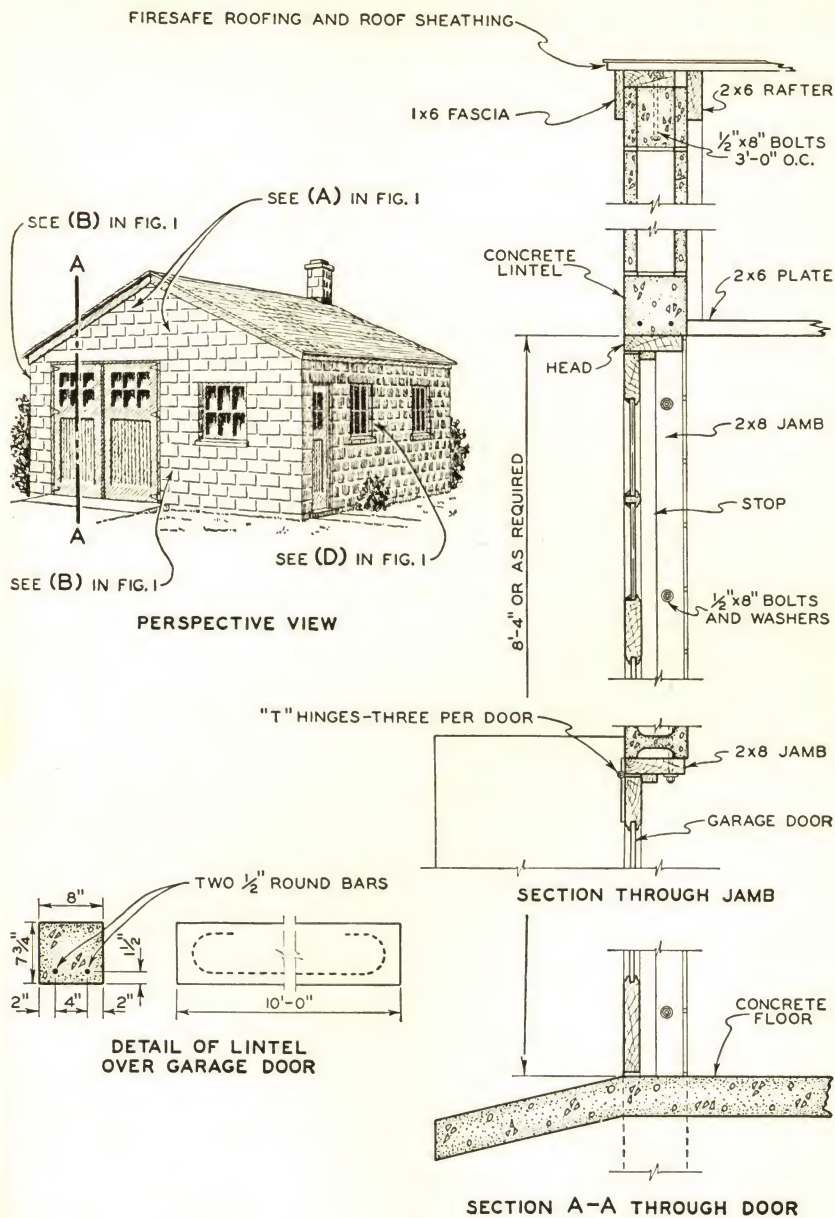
B. Perspective and Section Detail of a Garage and Shop Constructed of Concrete Masonry
